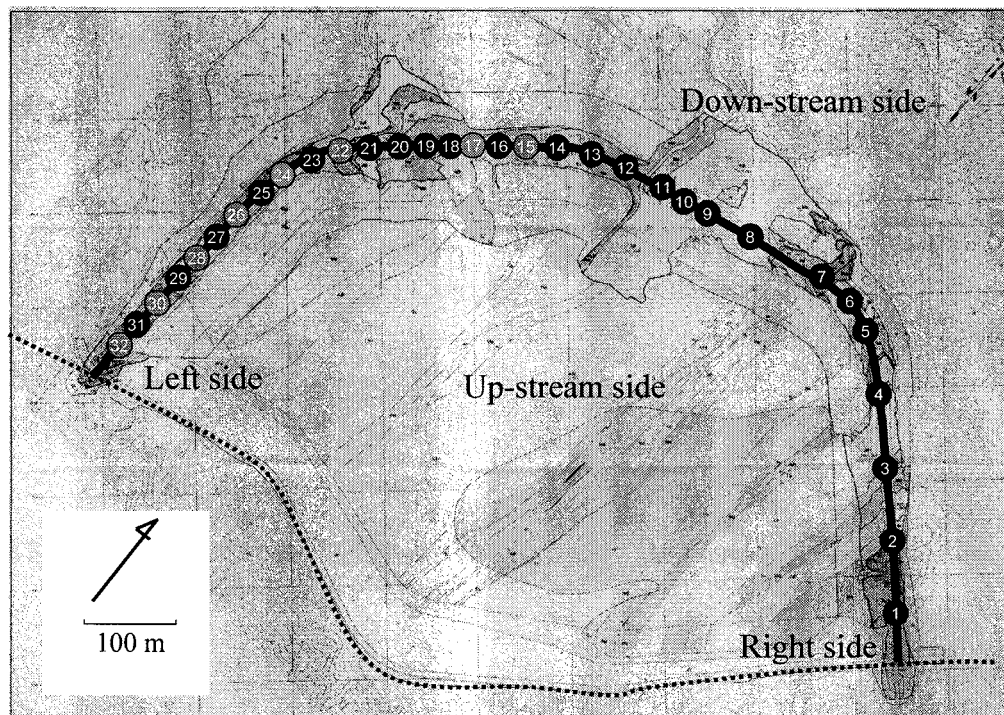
Plan of Shin-yamamoto Dam and Location of Measurement Points
